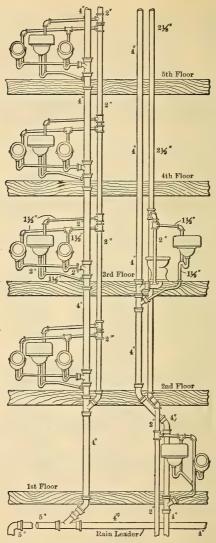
Toilet Fixtures from the First to the Fifth Floor in the Hibbs' Building.
